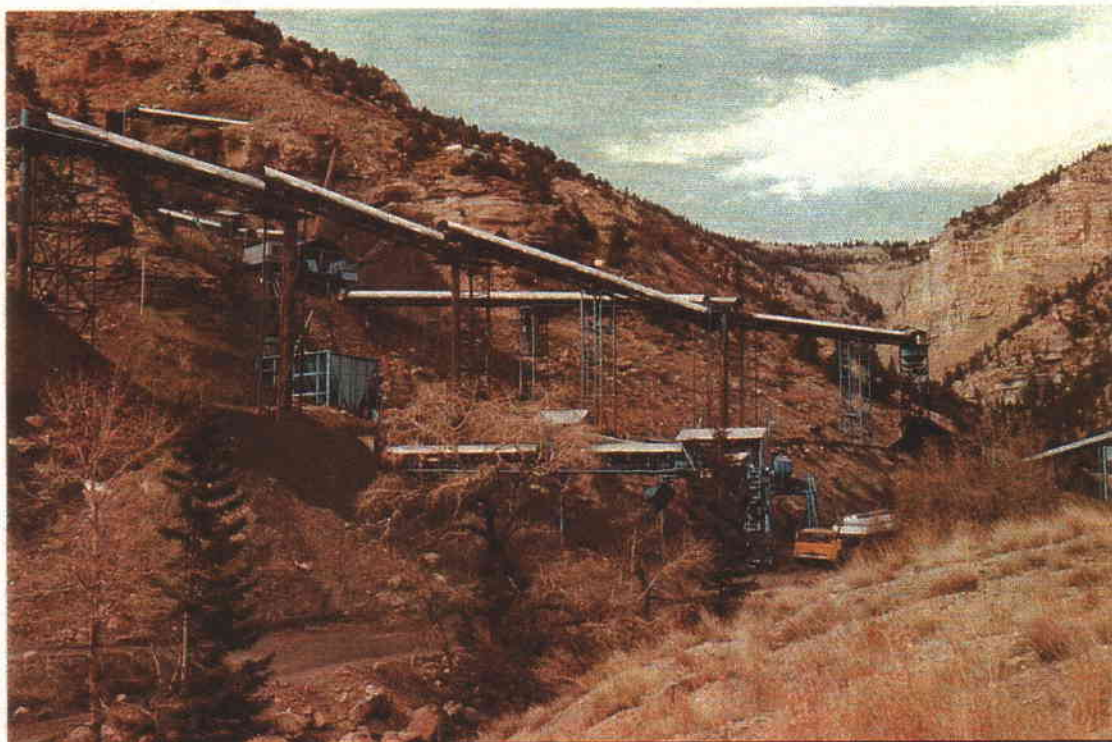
Truck Loading Facility, Oil Slack Loading Facility, Storage & Stacking Facility
